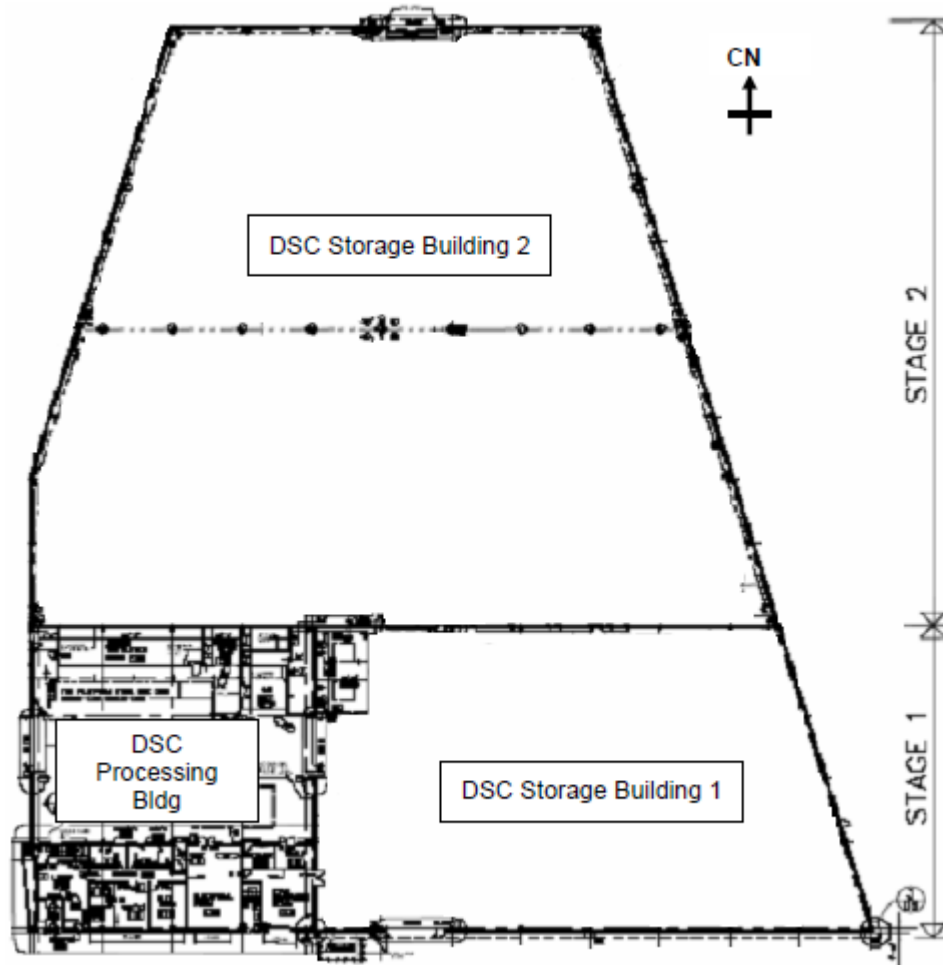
Pickering Used Fuel Dry Storage Facility – Phase I Layout
